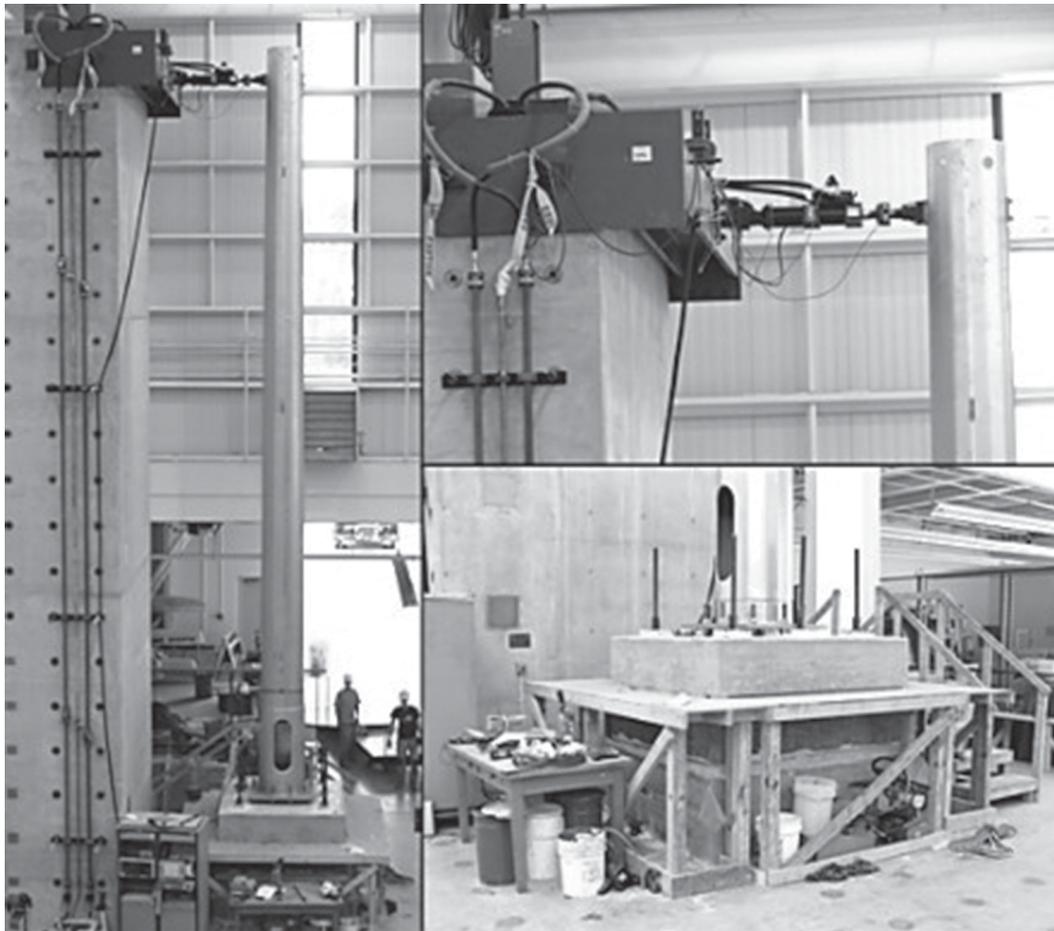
As-built specimen test set-up (similar for all other specimens).
